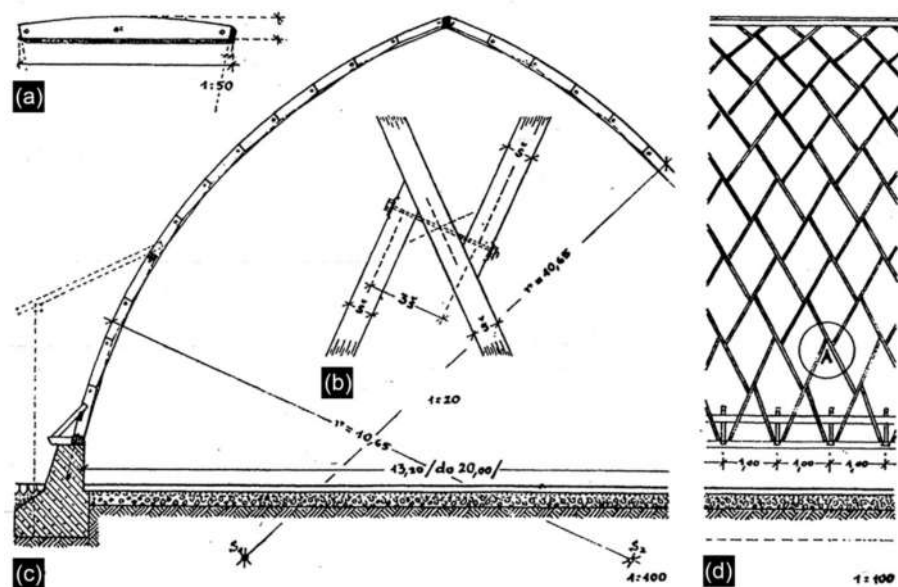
Zollinger lamella roof design: (a) lamella detail with dimensions, (b) joints of lamellae, (c) transverse section and (d) longitudinal section of the roof for housing [6].
